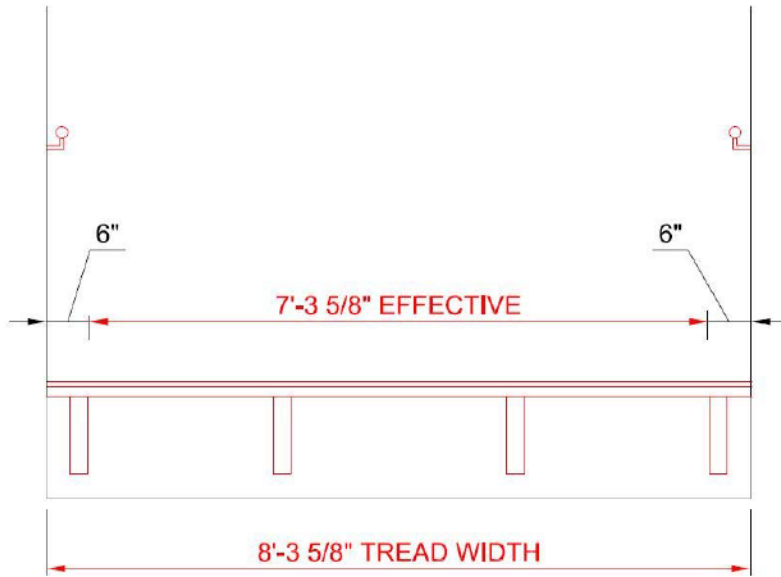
Proposed cross section of stair S1/P1 with multiple stair stringers beneath full width stair treads.
